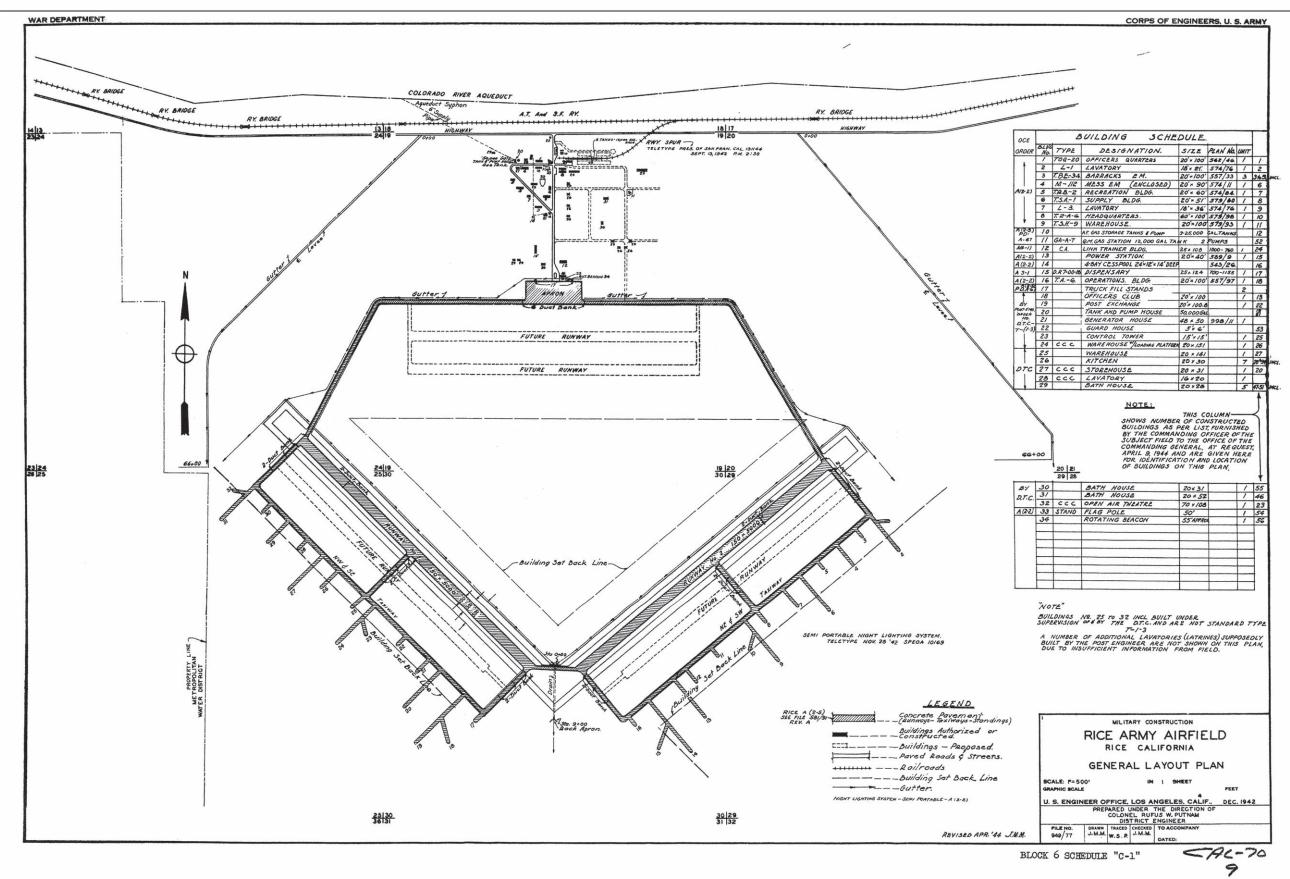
RICE ARMY AIRFIELD GENERAL LAYOUT PLAN, 1942-1944
